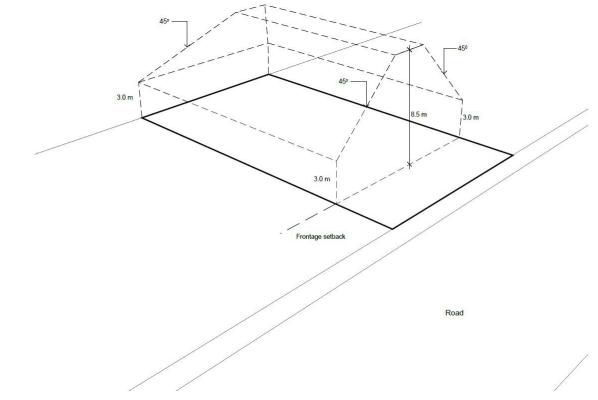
Building envelope as required by clause 10.4.2 A3(a)
